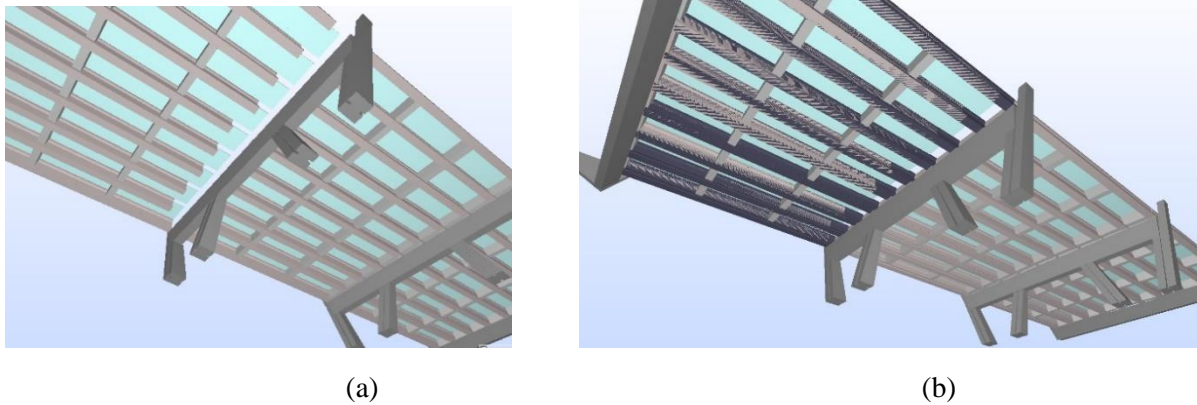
(a) Girders modelled too short due to occlusion; (b) addition of full length girders to the model. Note that the original girder geometry is retained for review if need be.
